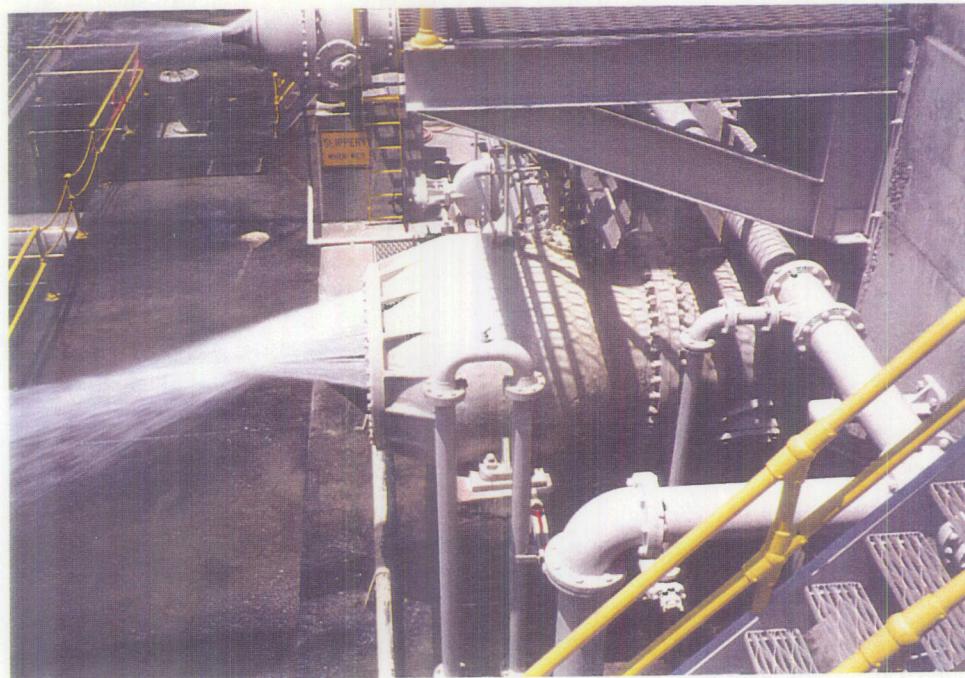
Morris Dam - Needle Valve 3 - View showing needle valve body, piping, and leakage at full head. 07/01/98
